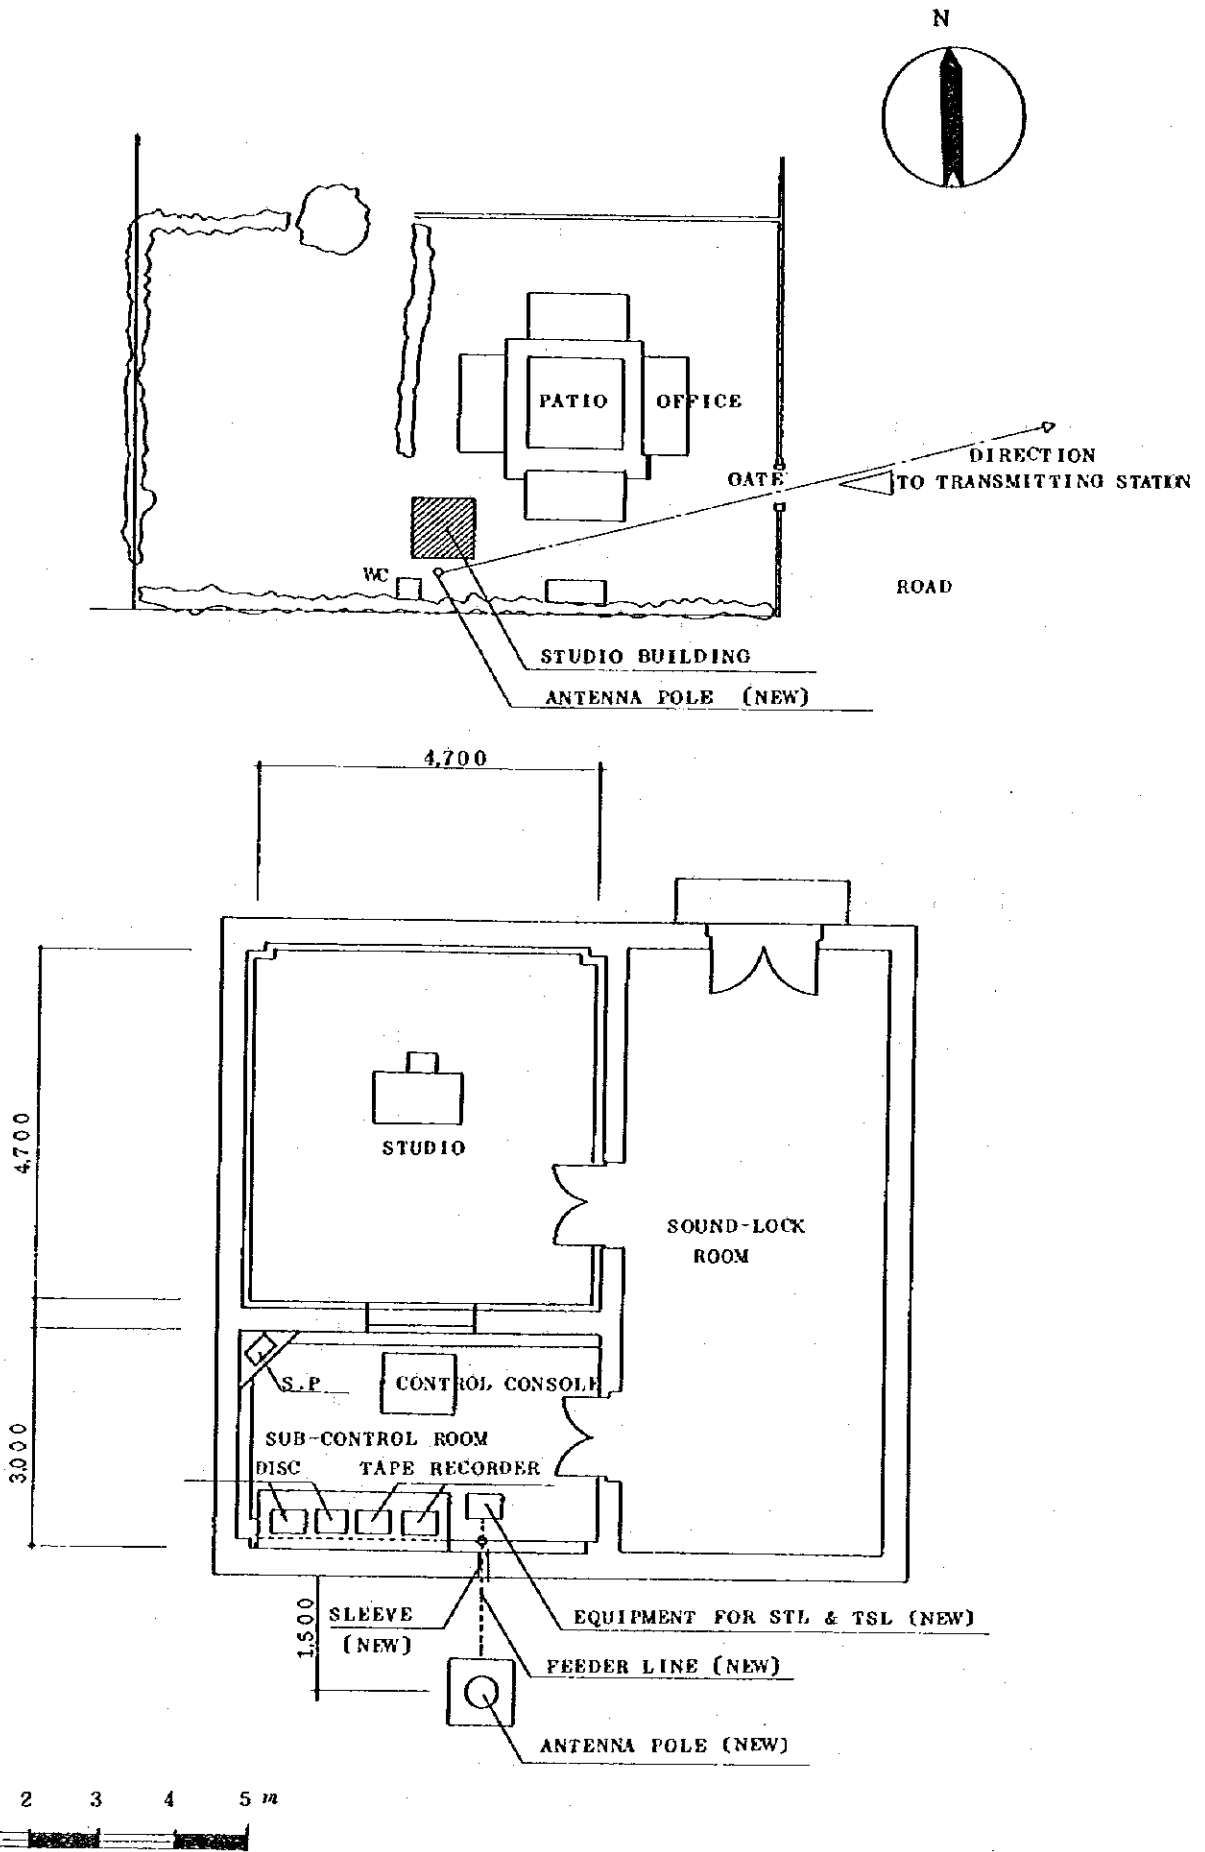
Layout of the Equipment and Other Facilities (El Obeid)
